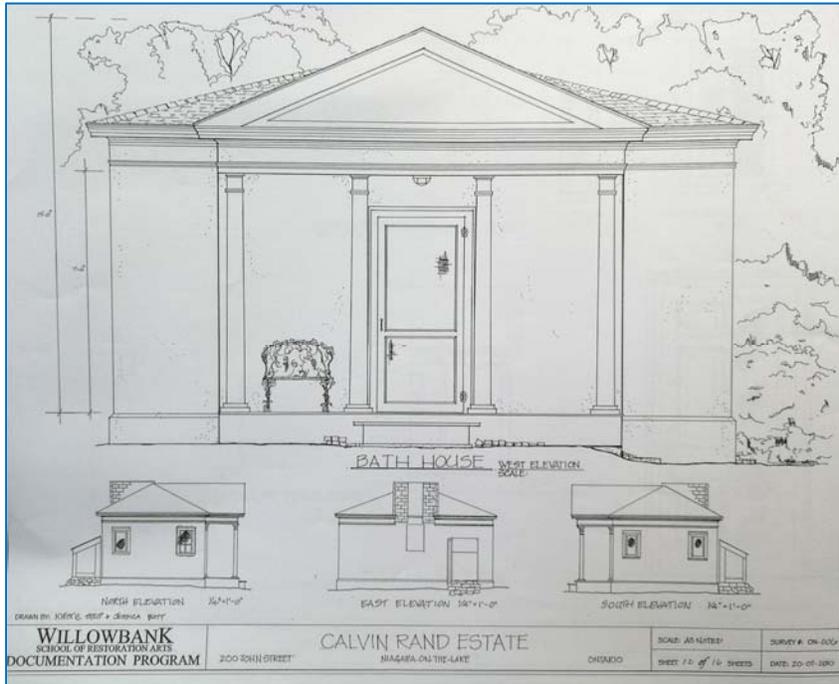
Elevation drawings of the bath house (Willowbank, 2010).
